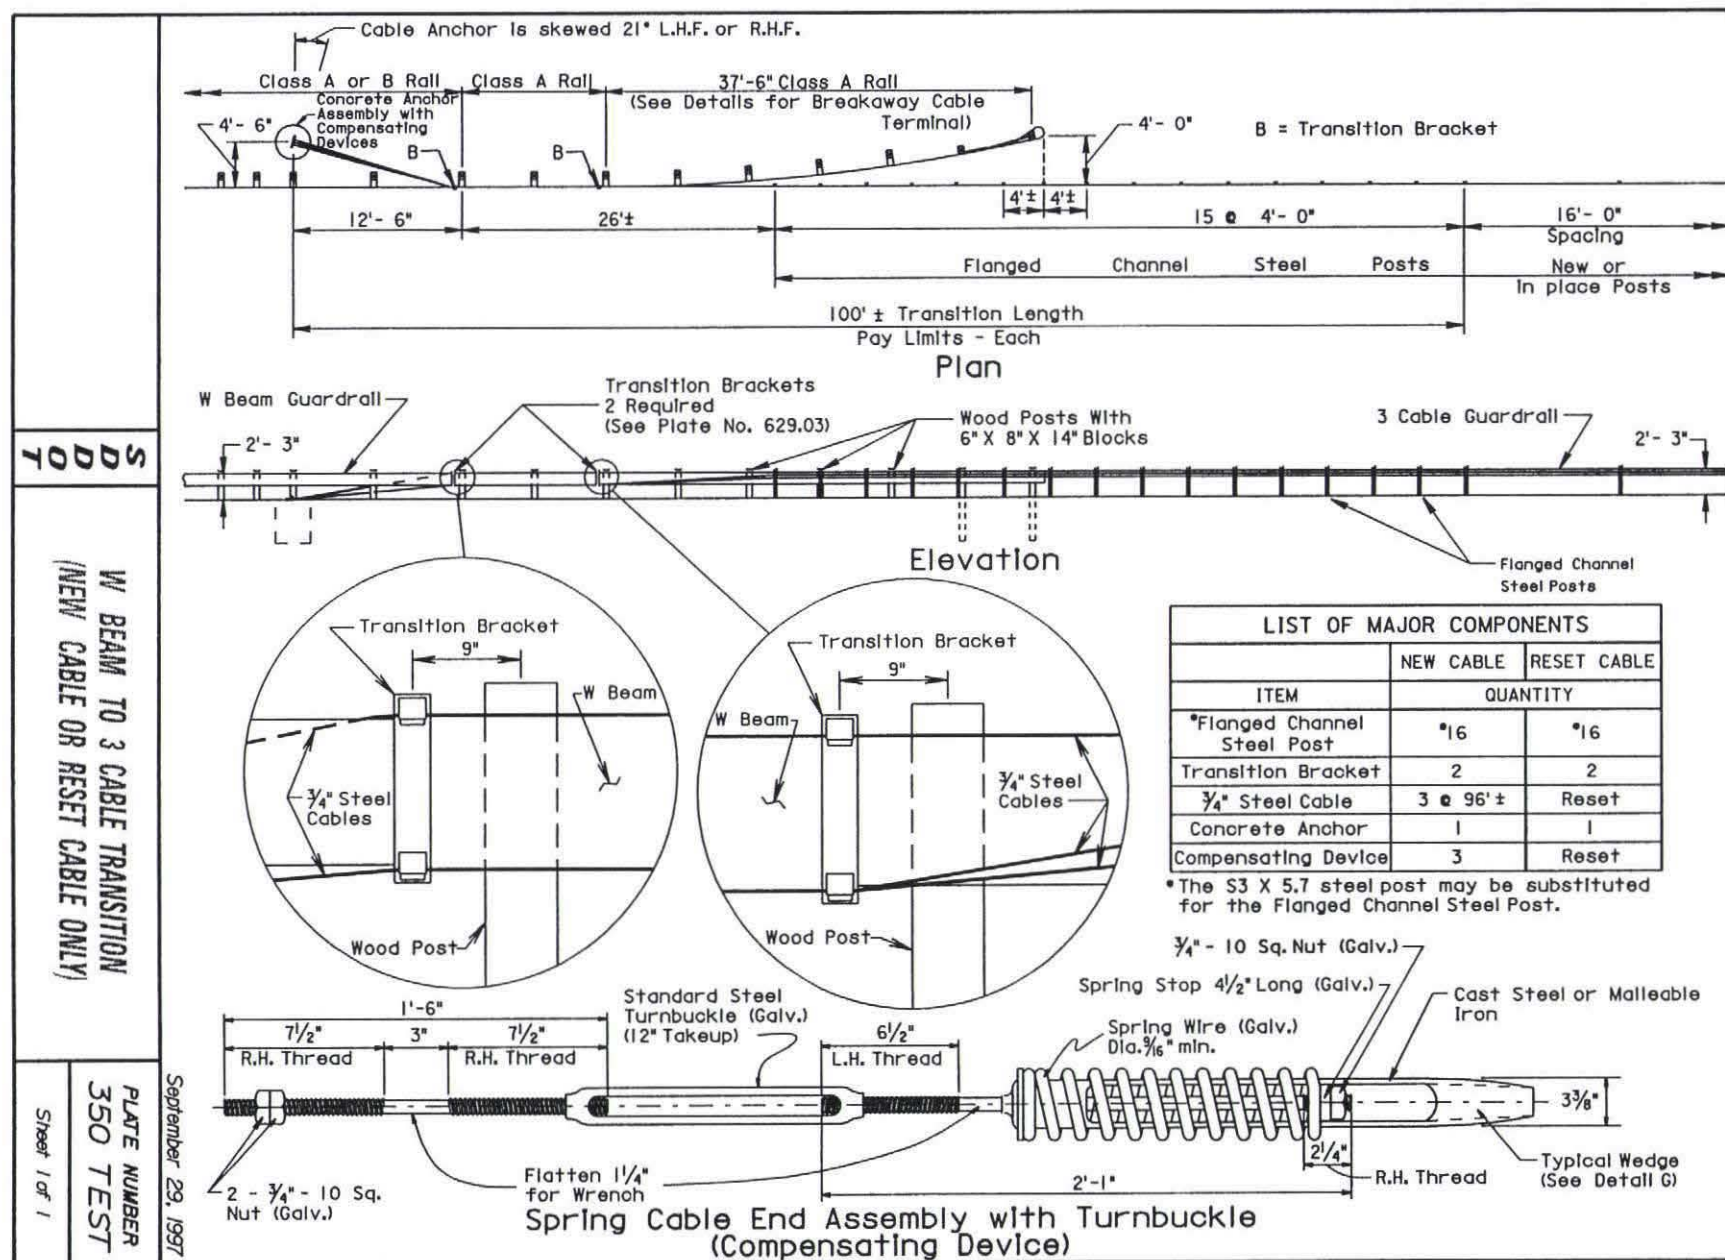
Cable Guardrail to W-Beam Transition Design Details
